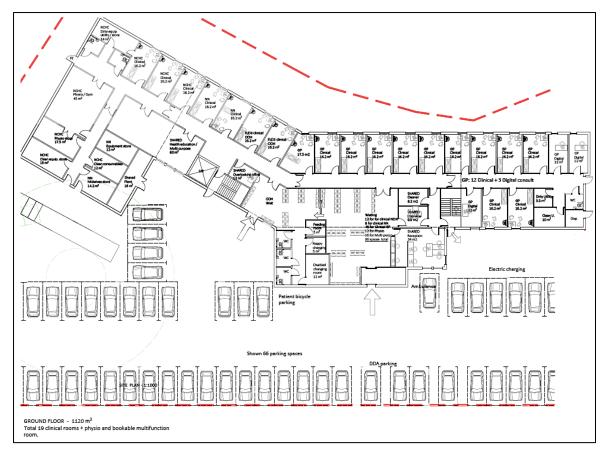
Rackheath - proposed Hub Ground Floor Plan
